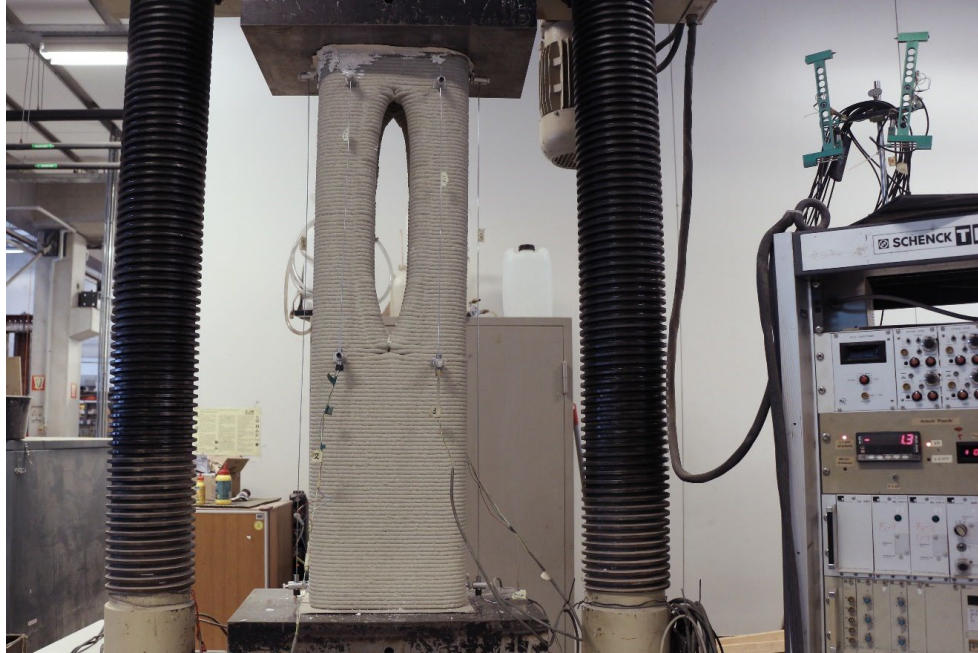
Fitting the 1:3-scale model into the load-testing machine
